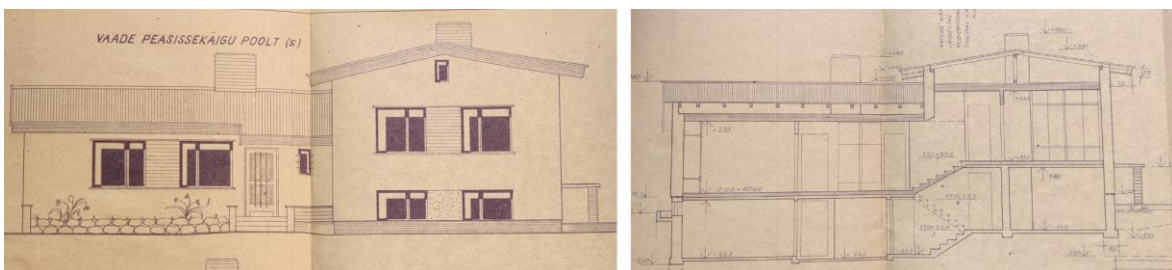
Loode 29 (1978) in Karksi-Nuia (left to right: elevation, section)
